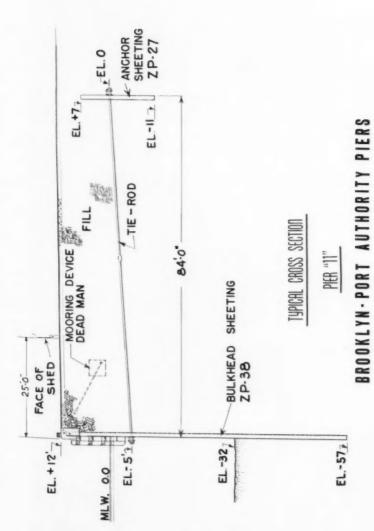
Brooklyn - P.A. Piers - Pier 11 - Typical Cross Section
